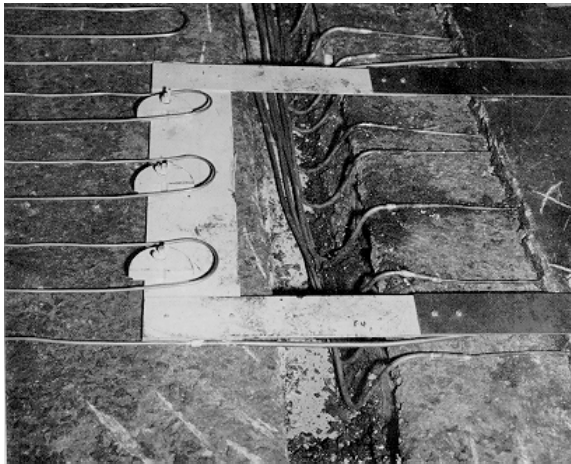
Electric cables in the bridge approach roadway, Newark, New Jersey 1961
